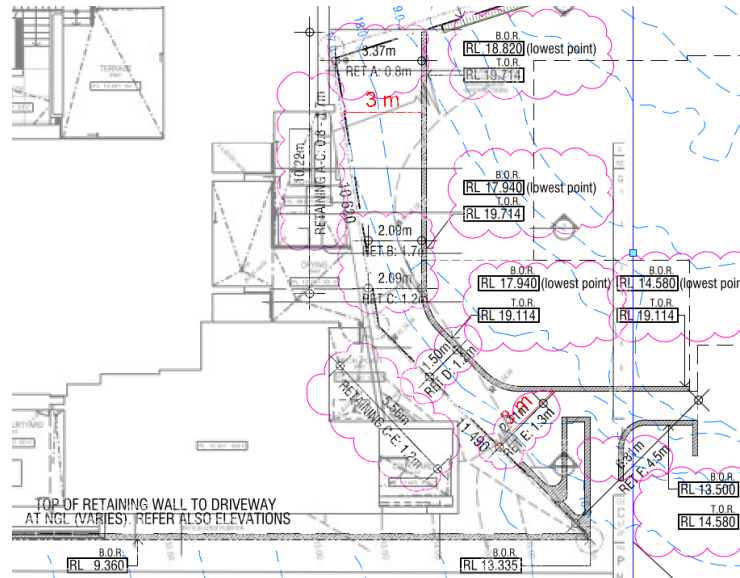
Proposed Western Retaining Walls Compared to 50A Blackwall Reach Parade.
